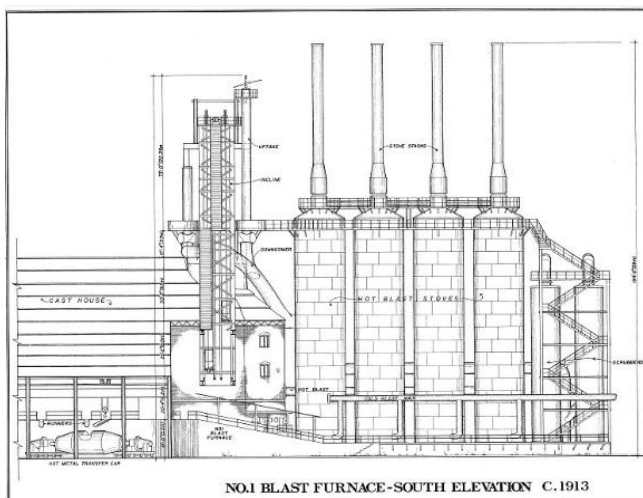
Elevation of Blast Furnace source Pittsburgh steel Co.
